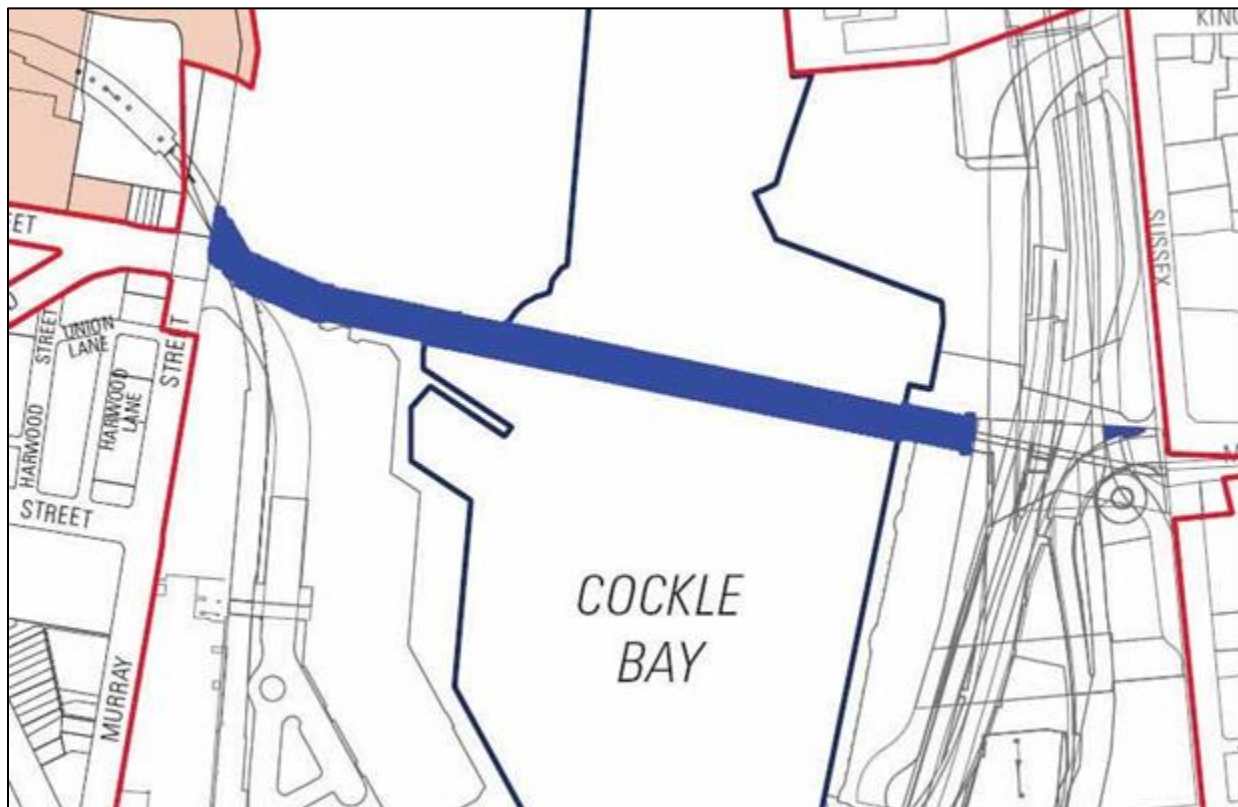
SURVIVING SECTIONS OF THE BRIDGE. SOURCE: PYRMONT BRIDGE CMP 2006:186.
